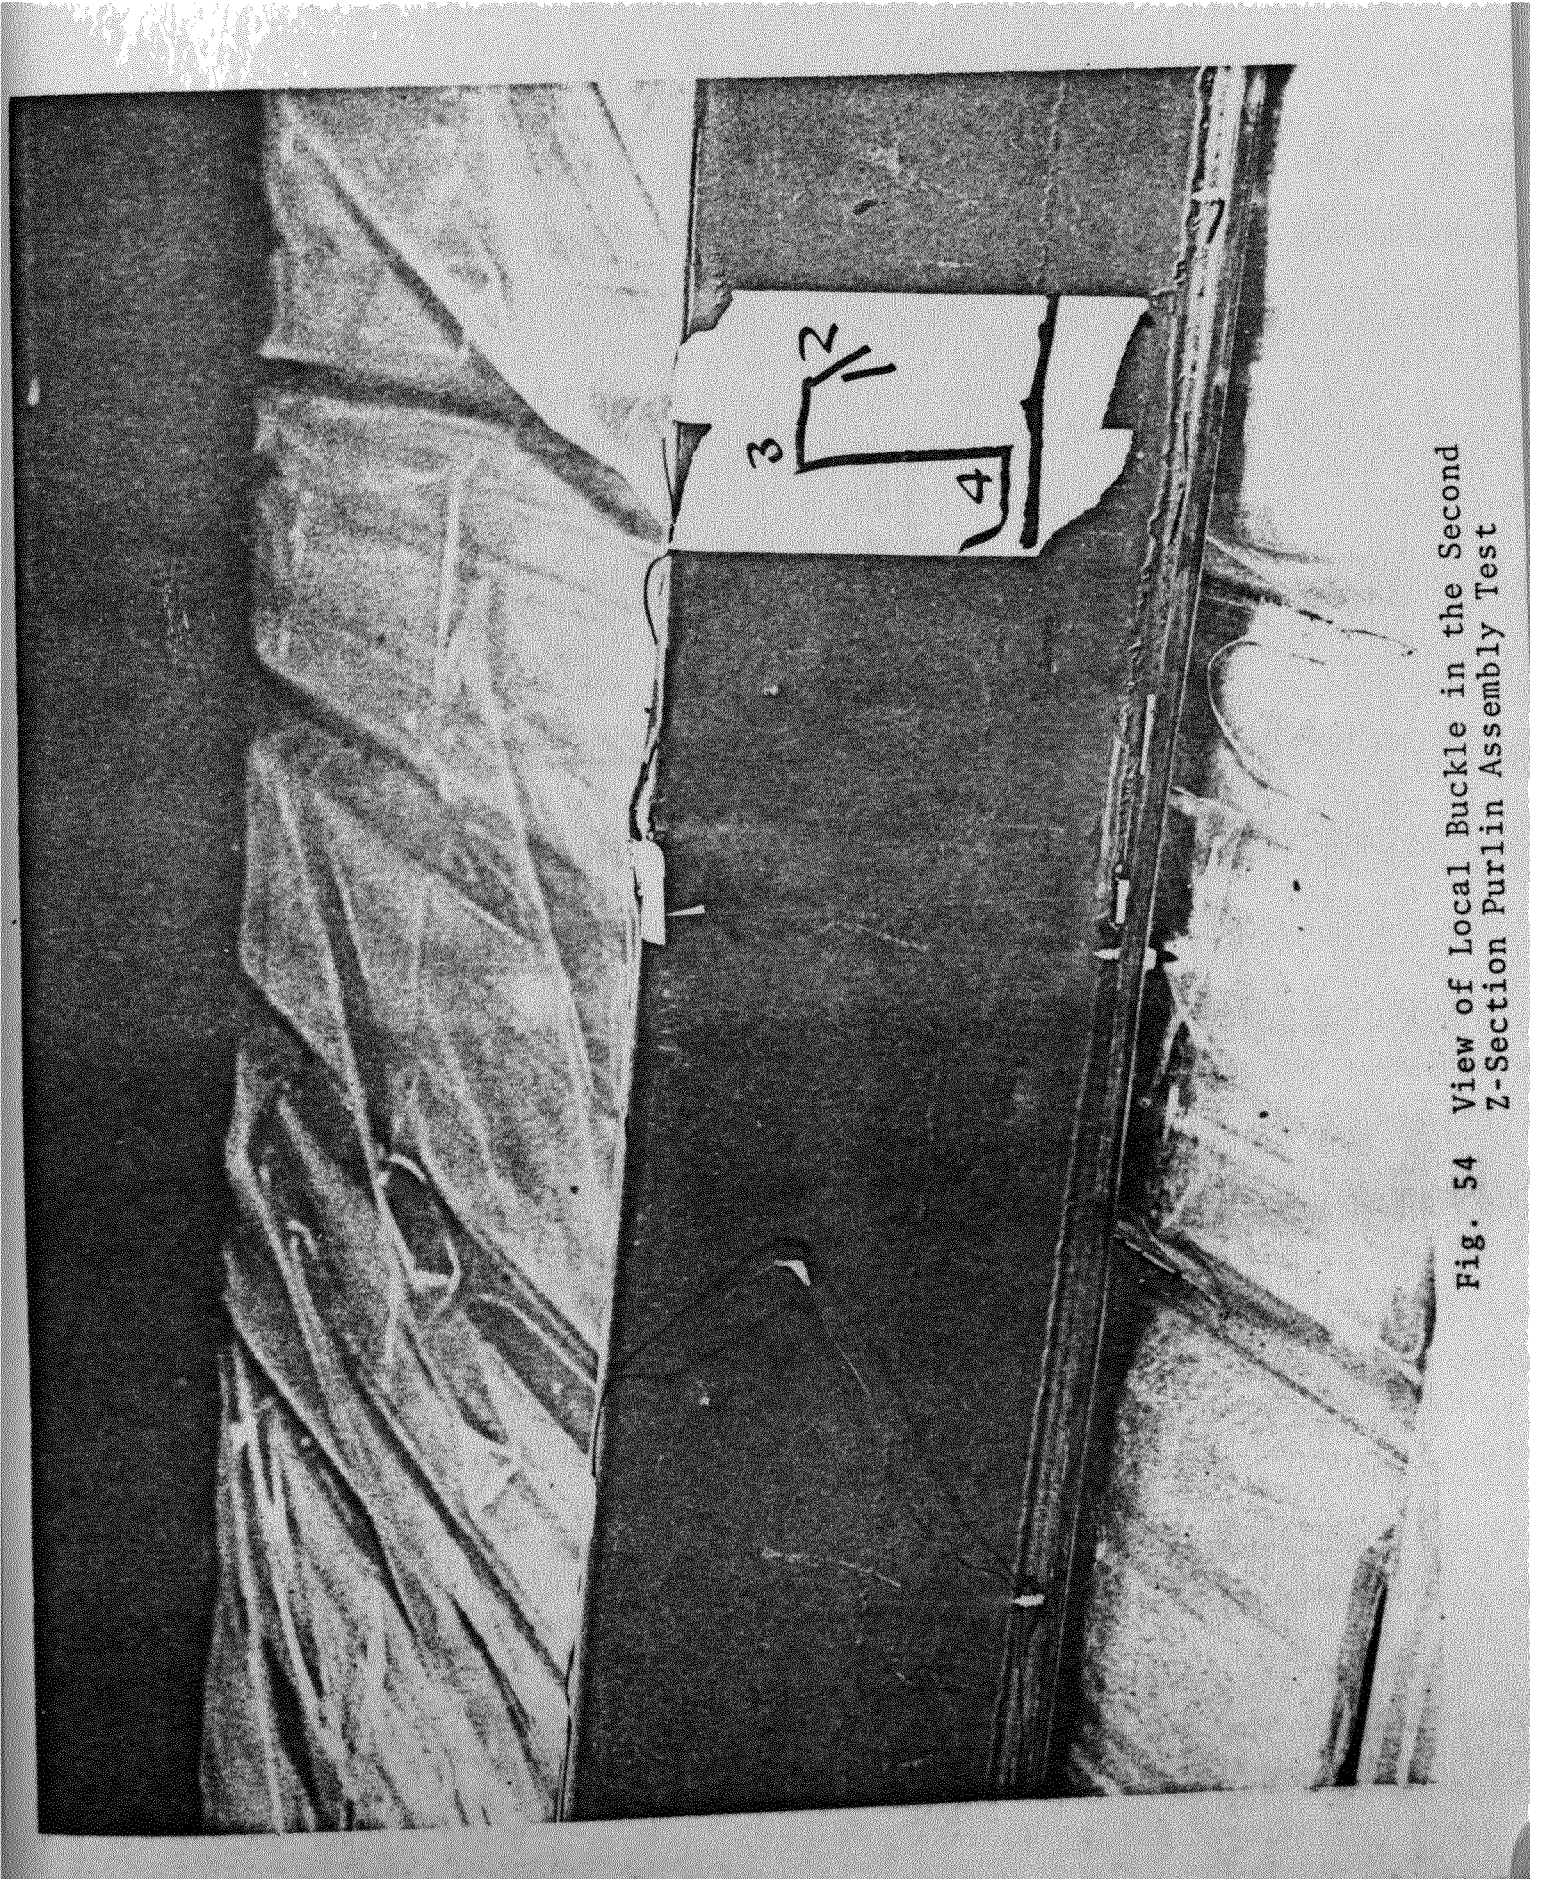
View of Local Buckle in the Second Z-Section Purlin Assembly Test
